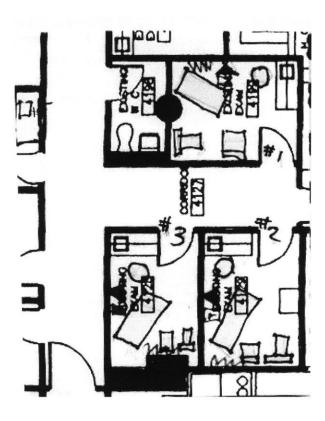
Drawing of the exam rooms that Dr. Eva Jones uses for her clinical practice. Focus of drawing is the dead-end corridor which accesses these rooms.
